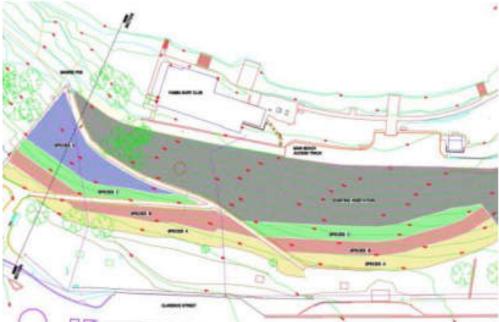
Proposed landscape plan - manicured horticulture placement slope treatment – Flinders Park
